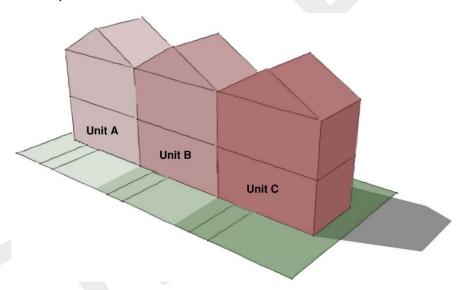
Illustration of Attached Dwelling, 3-Unit Rowhouse / Townhouse on Separate Lots
